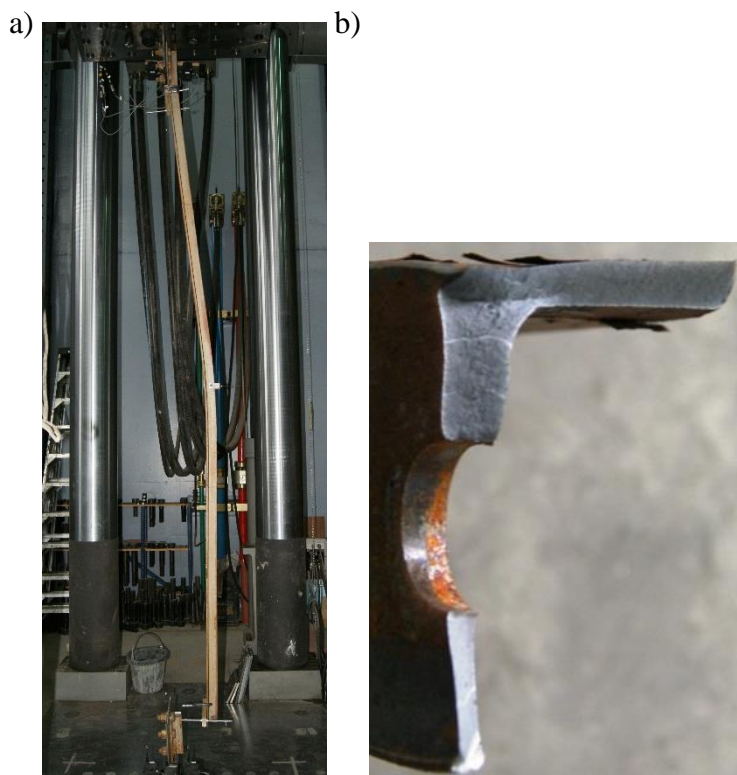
Specimens No. 5 - observed damage after the test: a) residual deformed shape; b) failed cross section
